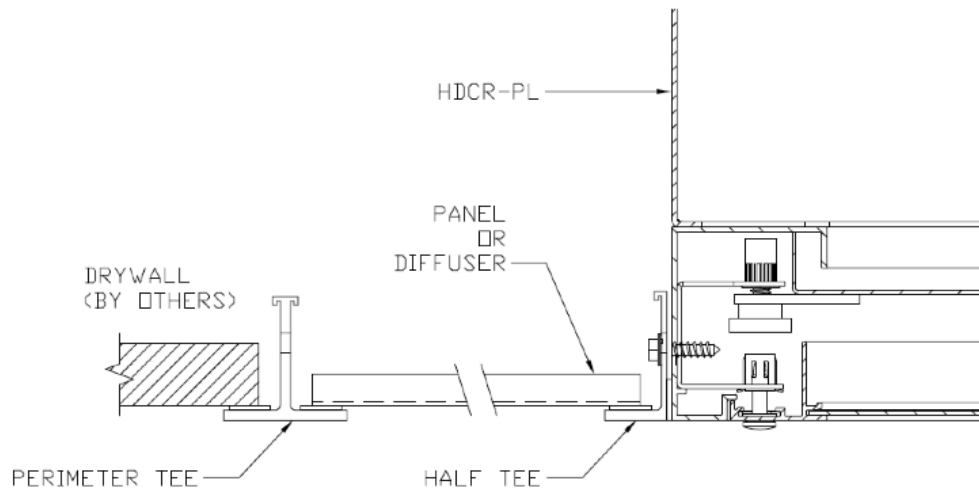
HGP with Perimeter HGWC and Drywall Elevation View
